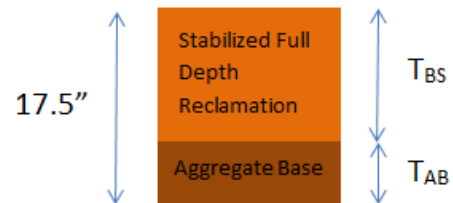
Diagram to show the proposed road section expressed in terms of GE values
